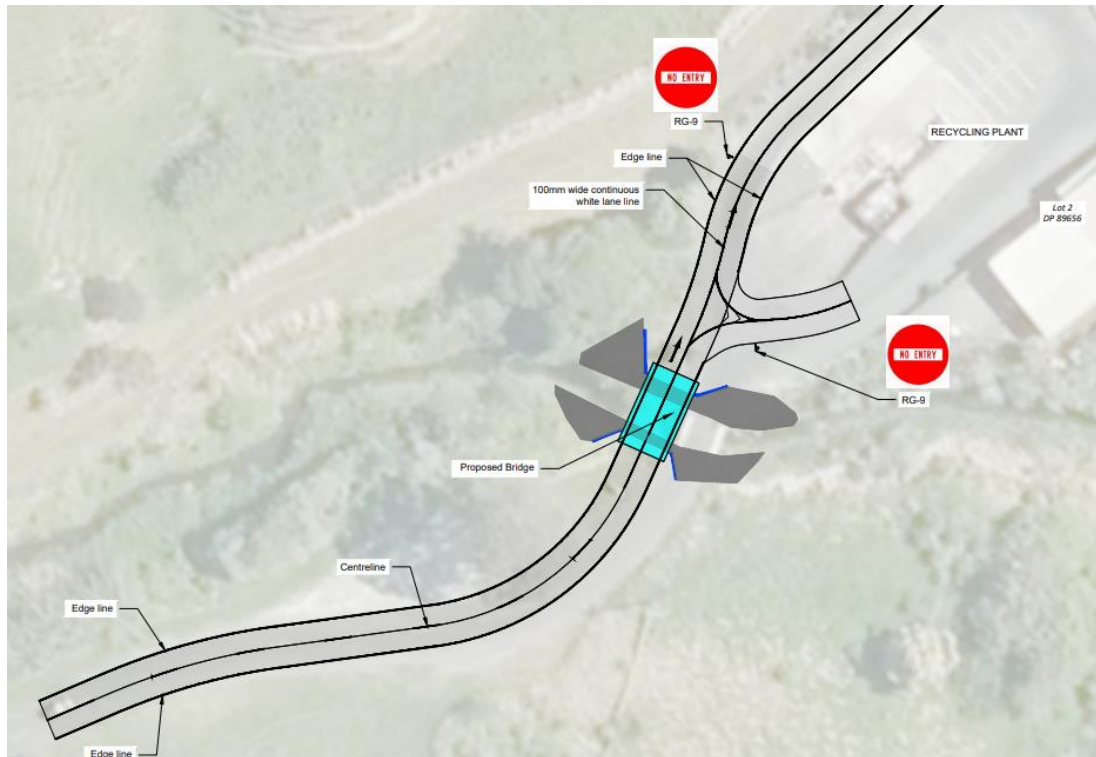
Proposed single span bridge with abutments, retaining walls and piles as per RC Engineering reports
